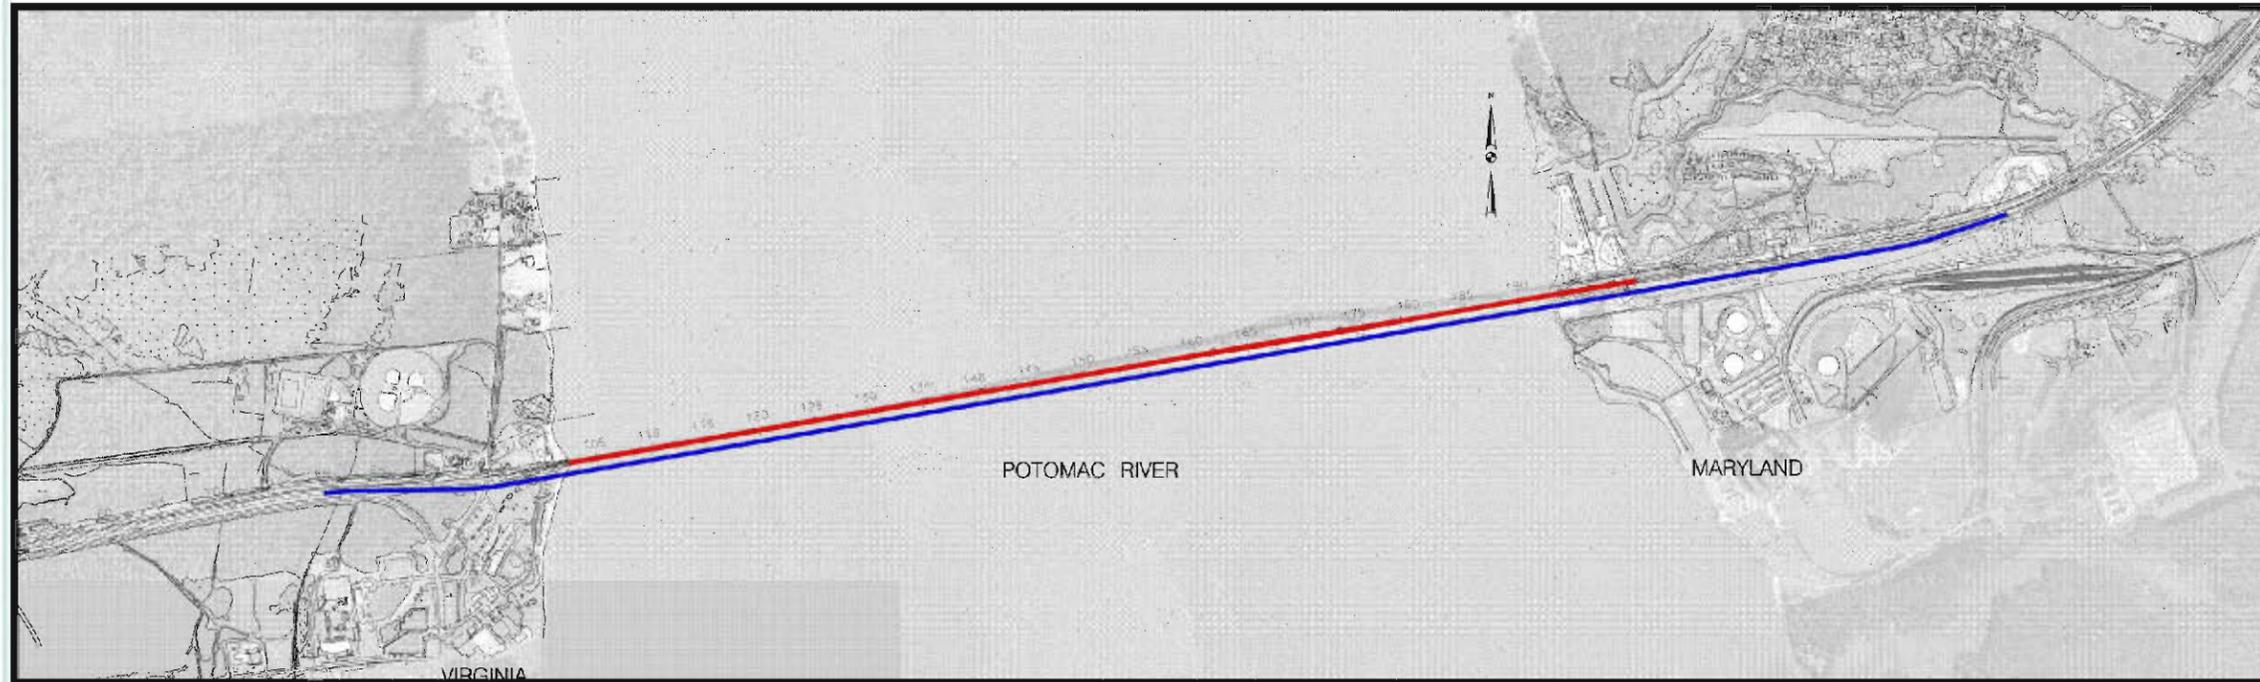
Alternate 3 - New Two-Lane Bridge to the South, Replace Existing Bridge.
